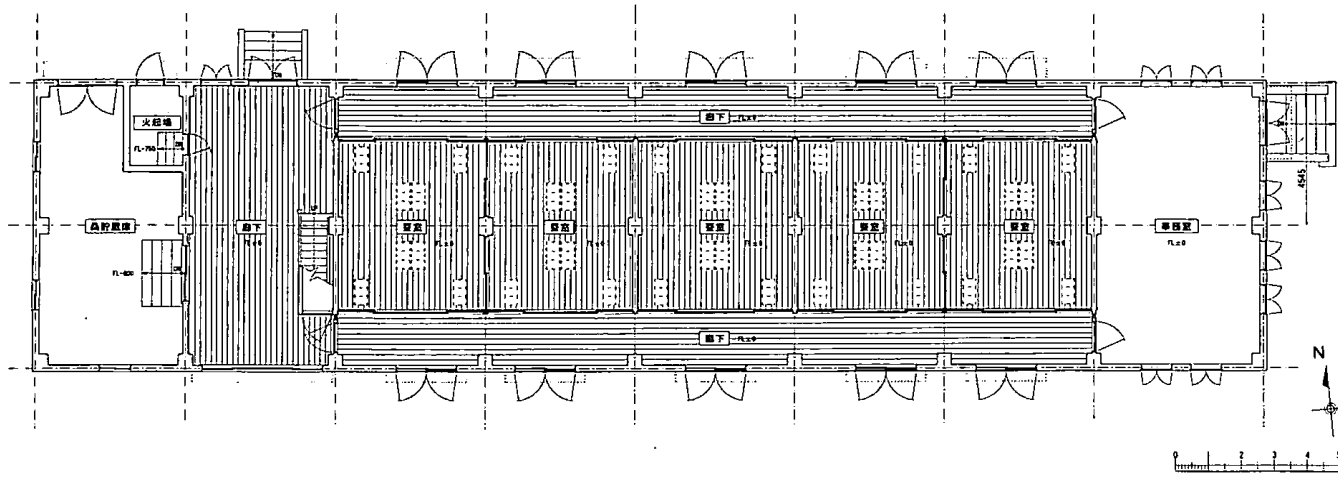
First floor plan of the Sericulture Experiment Laboratory.
